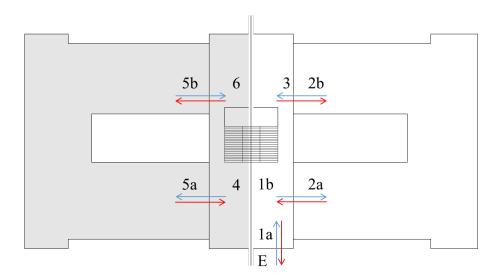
Schematic illustration of the test spaces (left part: first floor; right part: ground floor)
